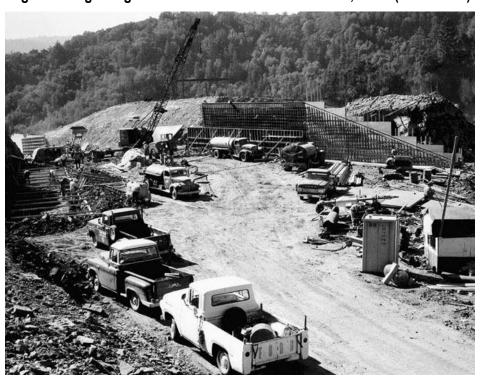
Construction of the Newell Creek Dam, 1960. (SCPL 2018)
